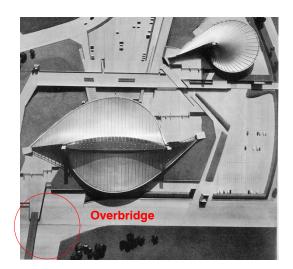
Site plan of Yoyogi Stadium Excerpted from *Shinkenchiku* in Mar. 1963
